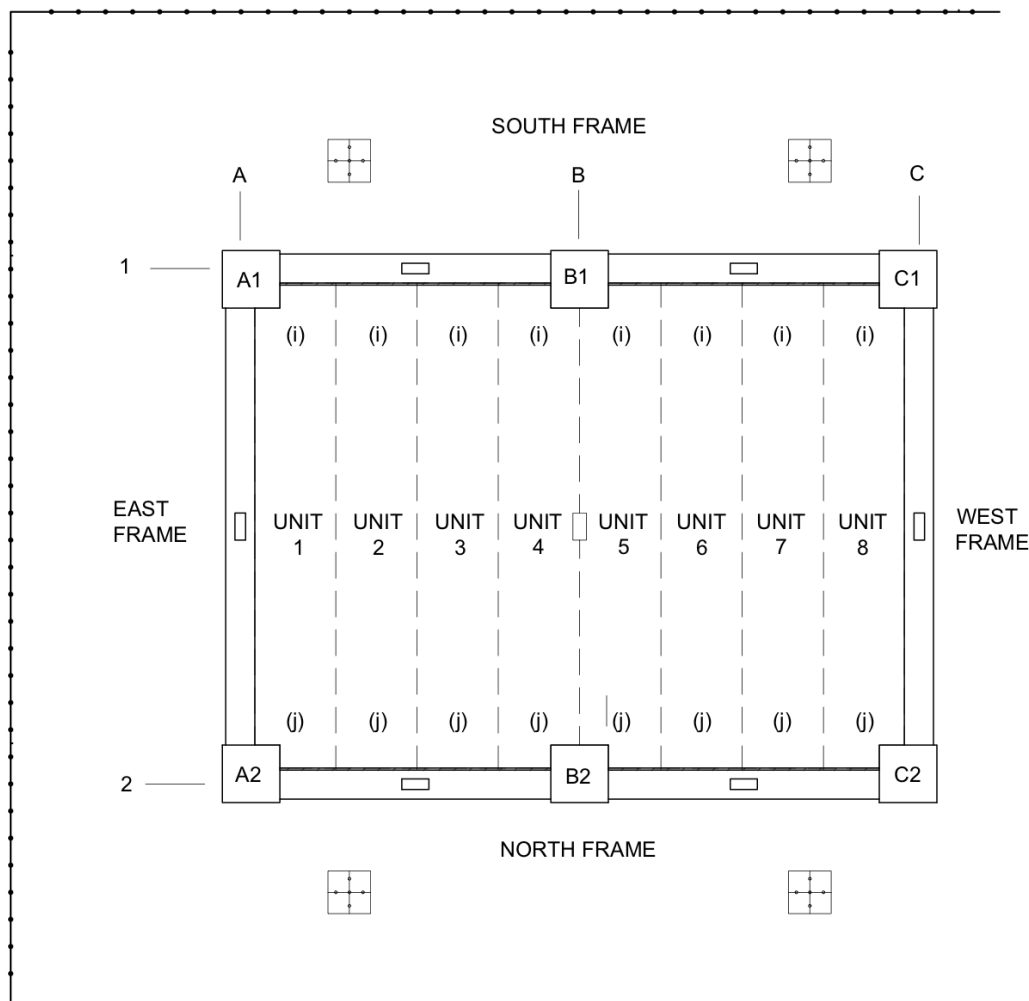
A schematic plan view of the eight hollow core floor panels mounted in a two bay, two storey reinforced concrete frame. The perimeter line corresponds to the strong wall to which the rams were connected.
